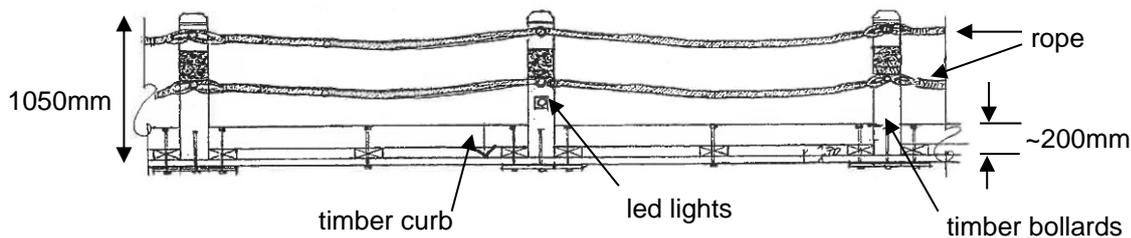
Diagram of modified barriers to the walkway (not to scale)
